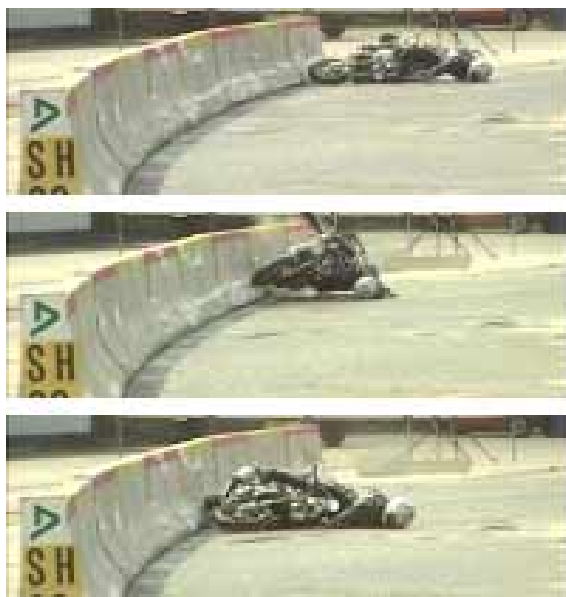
Full-scale crash test where the motorcycle impacts the concrete barrier protection system in a sliding position
